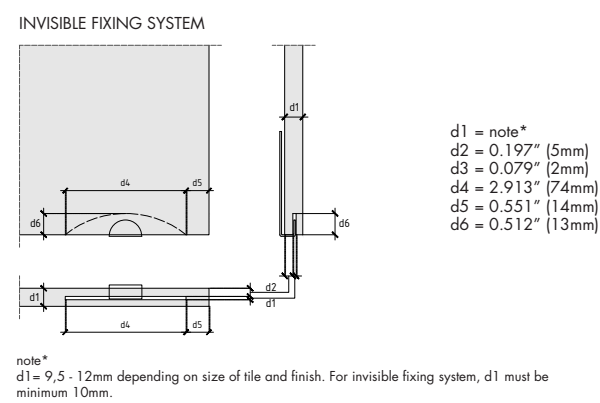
LOCATION AND DIMENSIONS OF FIXING PLATES AND KERF SAW CUTS
